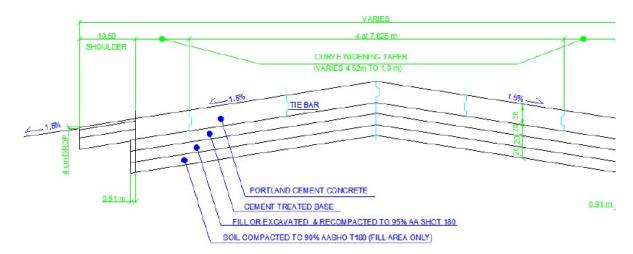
Typical Cross Section for Taxiway Rigid Pavement Section
